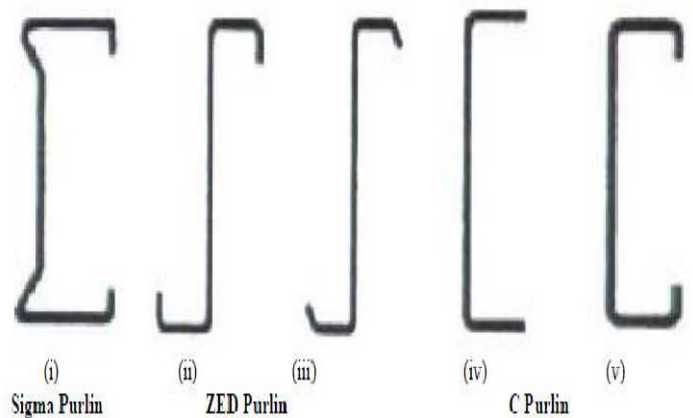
Typical Cold Formed Section Profiles used for purlin members
